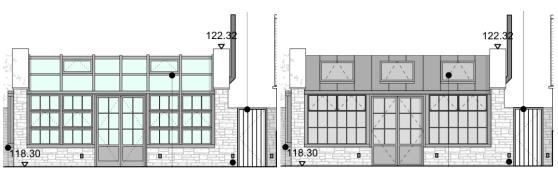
Proposed south-east facing elevation (left) and proposed north-west facing elevation (right)
